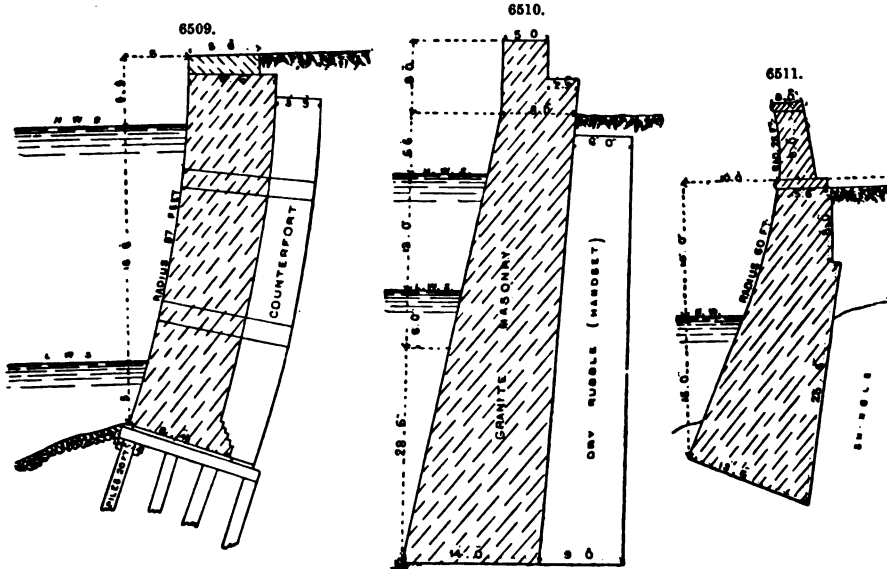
is the section of the sea wall at Penmaen Maur, by Robert Stephenson. The facing is of limestone ashlar, set in cement, for 18 in. inwards from the face. This section was adopted after failures.
